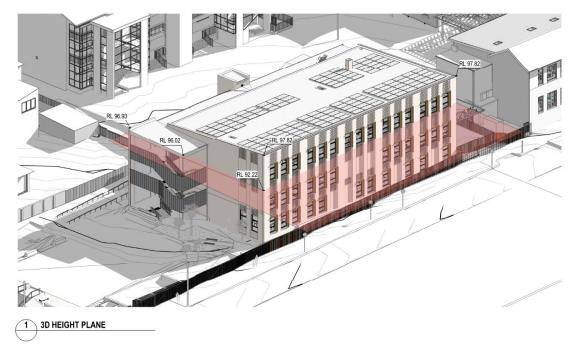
Extract of height plane diagram looking north-west (Source: DesignInc)
